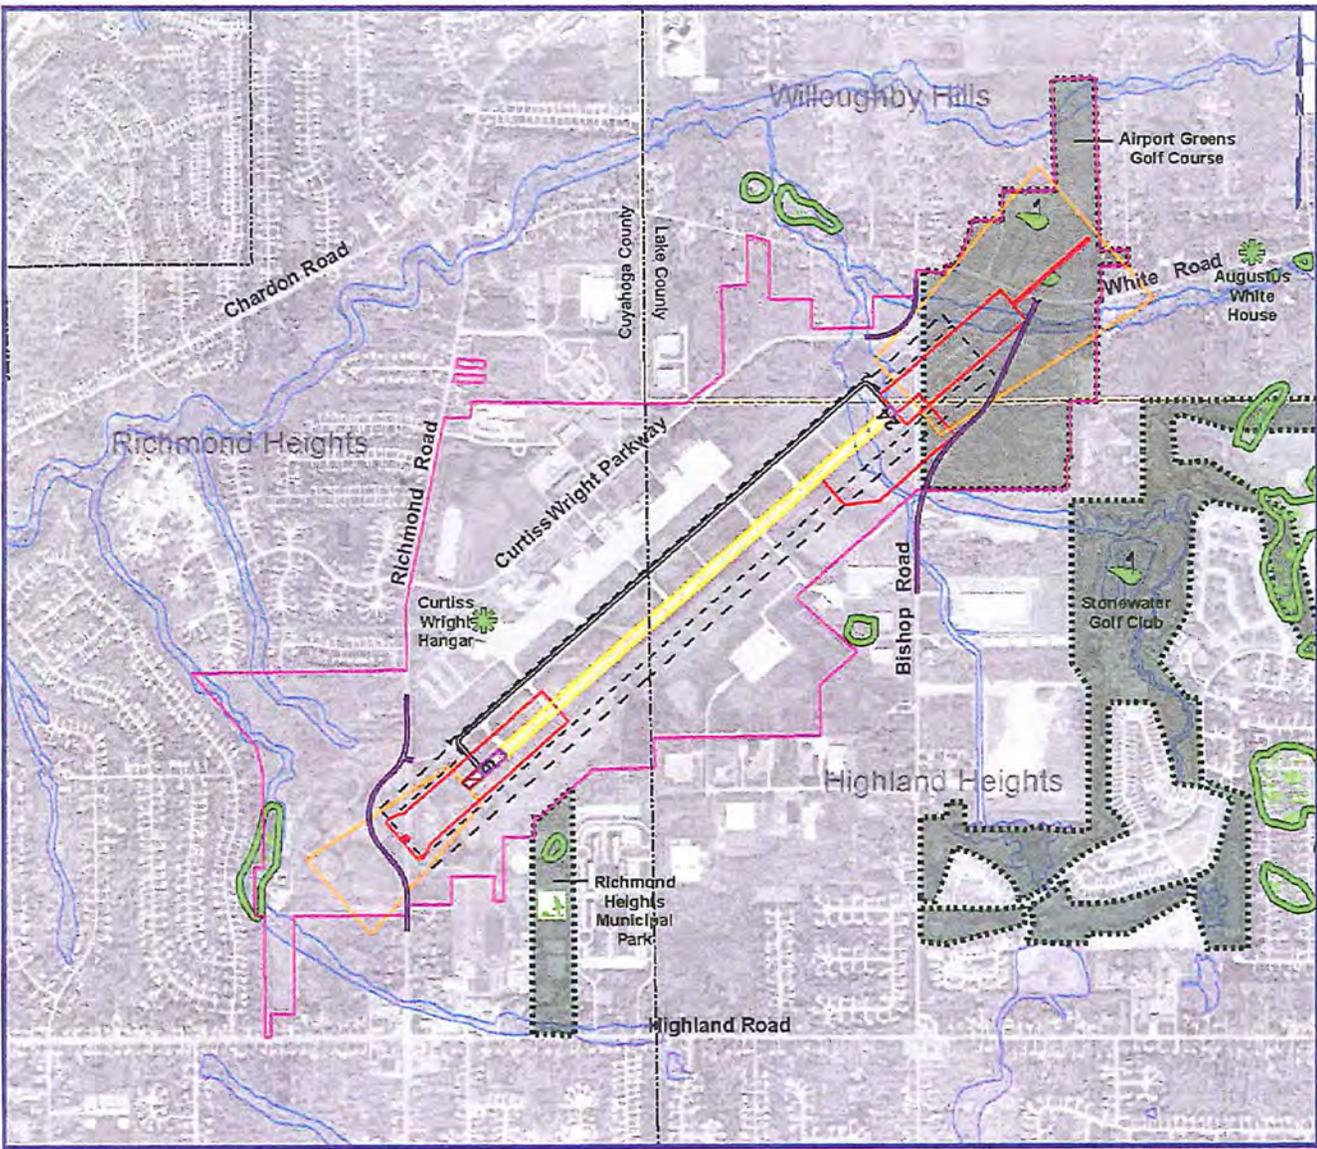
Alternative 18 – Runway 24 Extension to the East (Tunnel Bishop Road)
